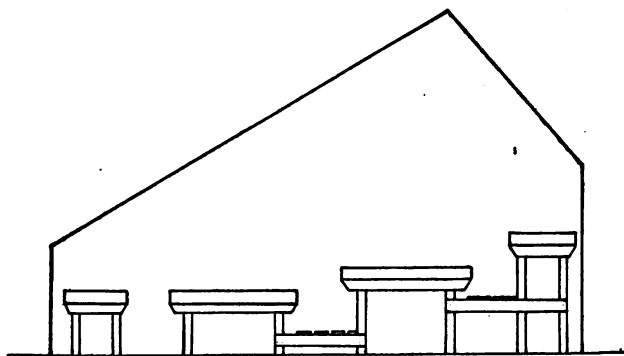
Method of arranging benches in an uneven-span house to secure best advantage of the sunlight than $5\frac{1}{2}$ or rarely 6 feet wide. In uneven span houses it is sometimes advisable to elevate the walks and benches.
